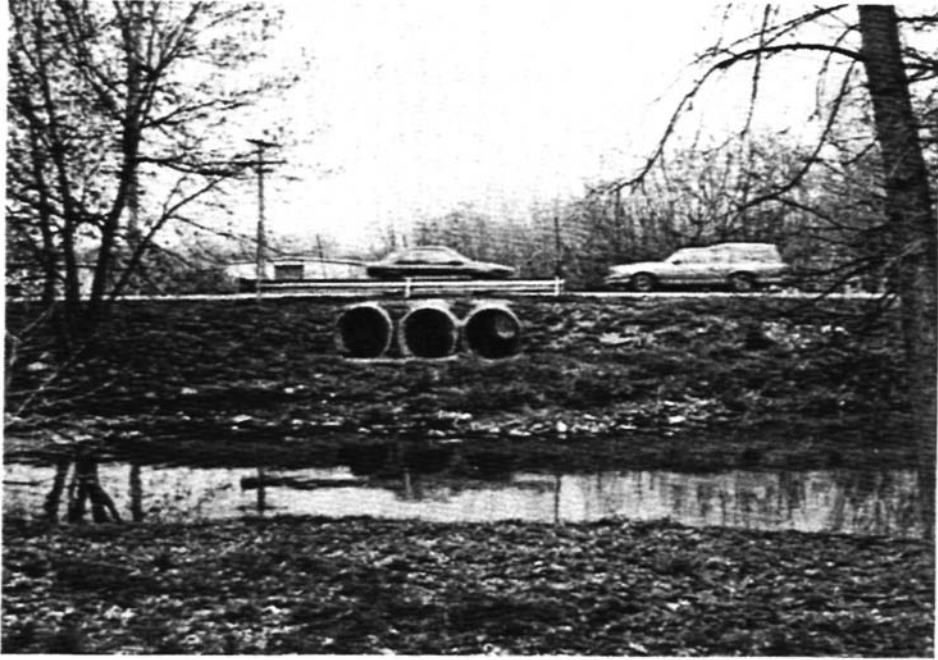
Culverts under Canal Street that are located between 9th Street Bridge and Lock 1
